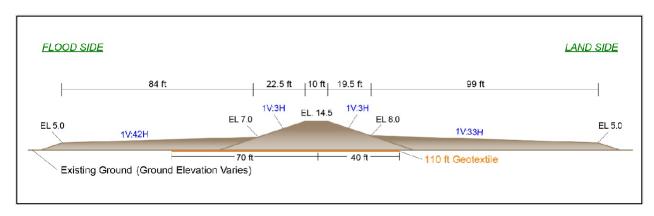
Typical Cross-Section with Berms for West Slidell
